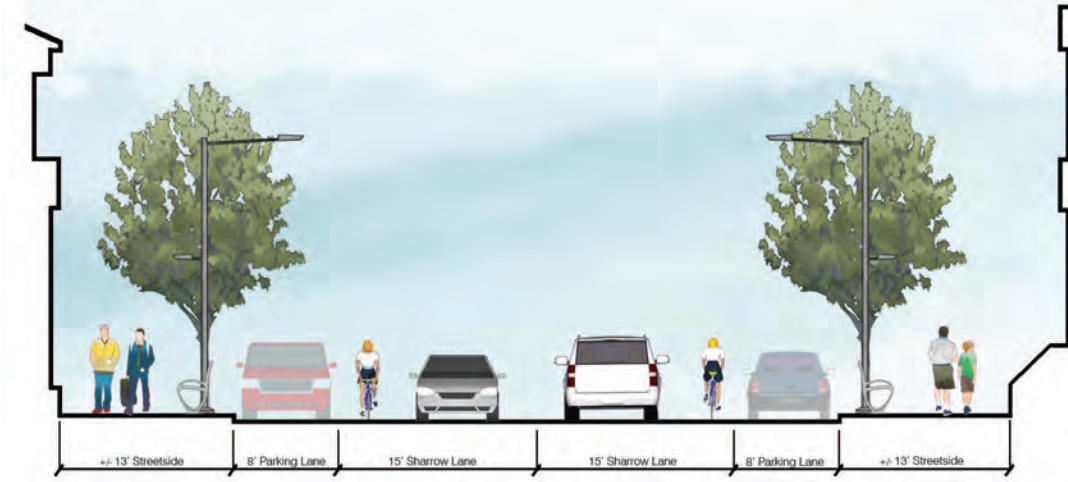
Jones Proposed Cross Section – Alamo to Broadway
